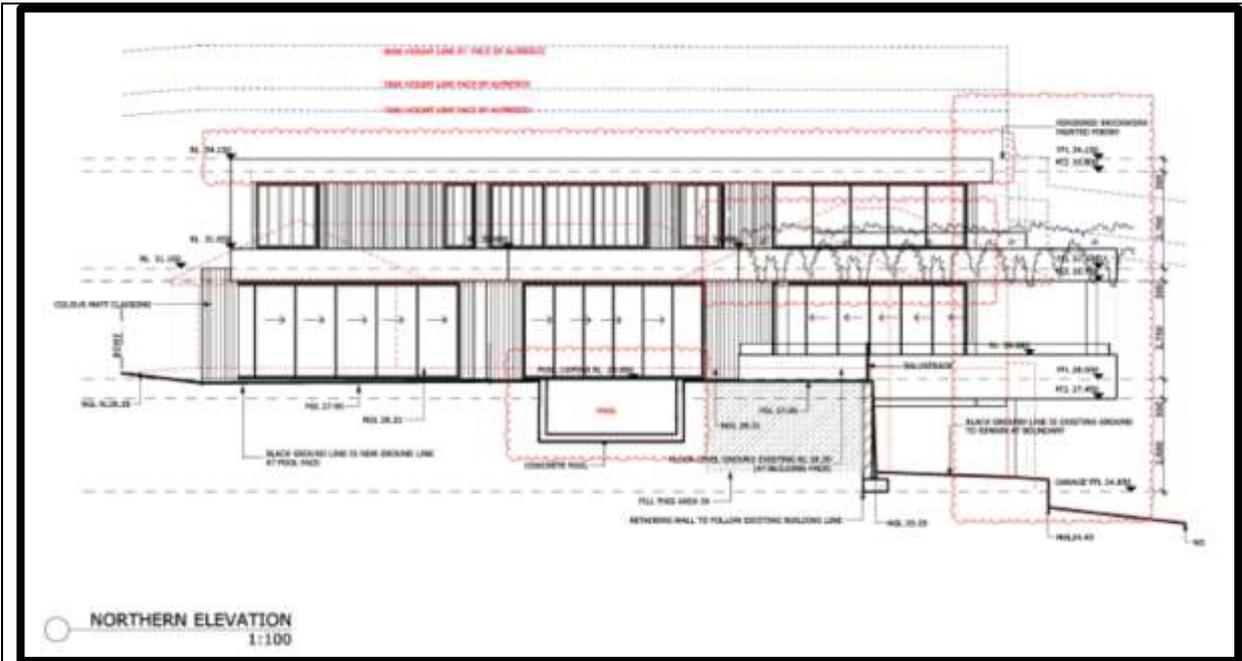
Extract northern rear elevation (Source: David Dechiara, 2020).
